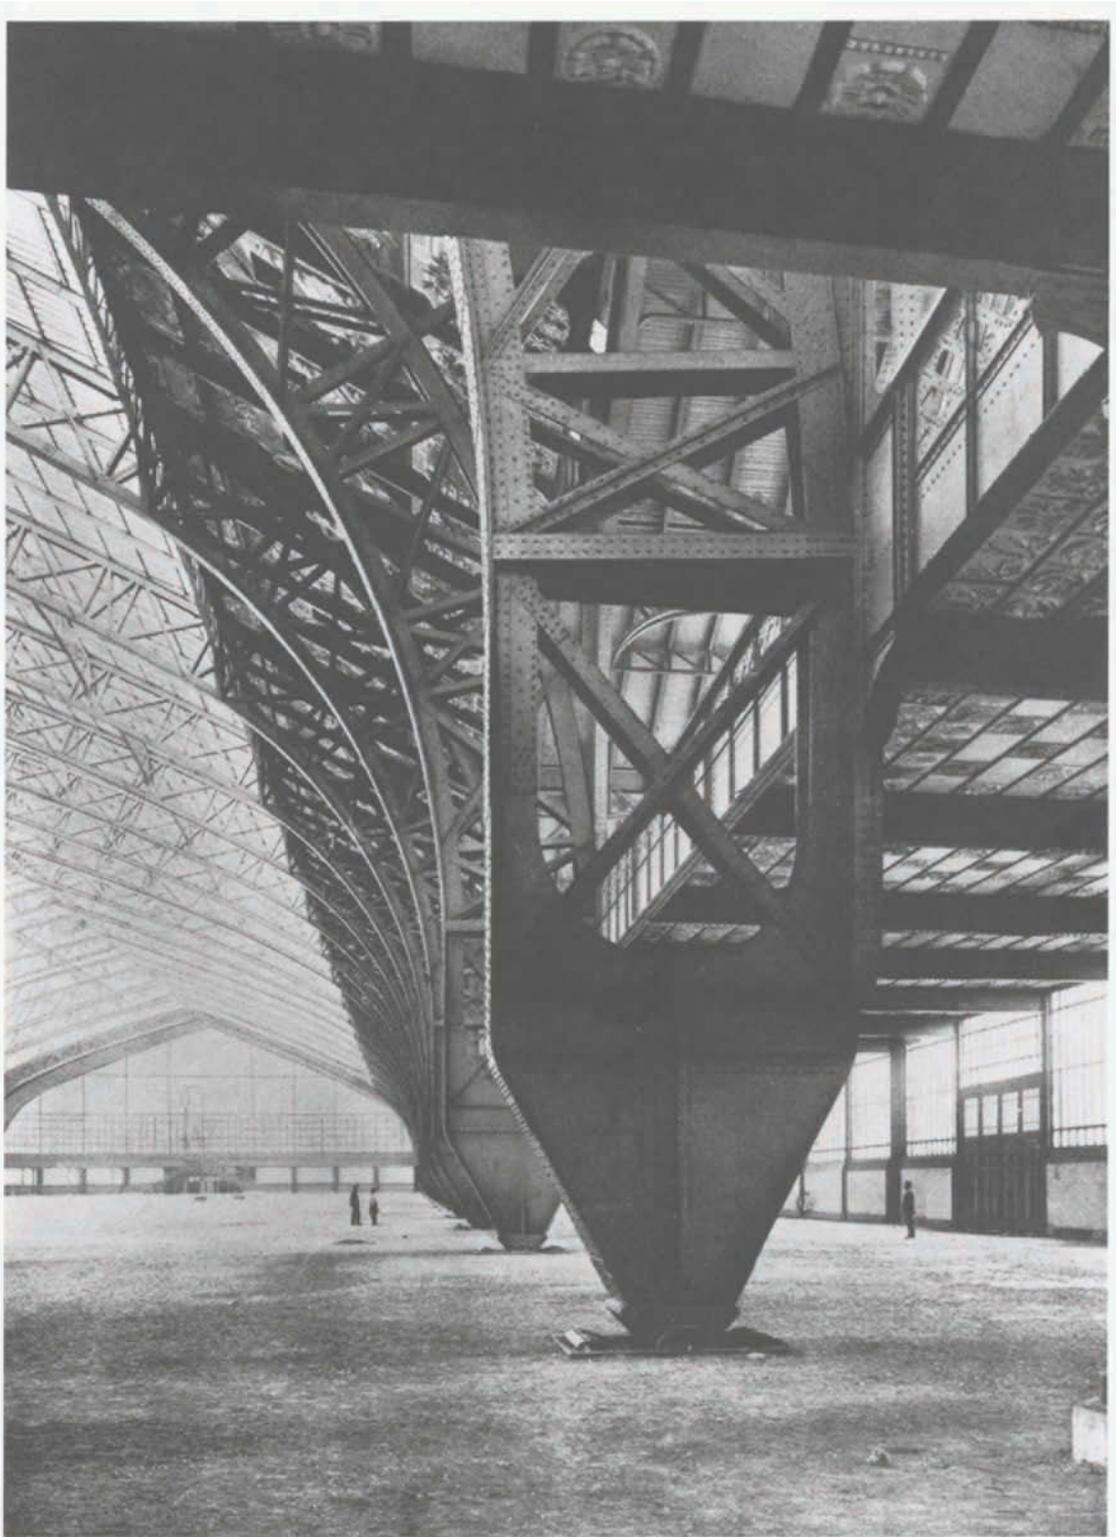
GALERIE DES MACHINES, PARIS 1889
